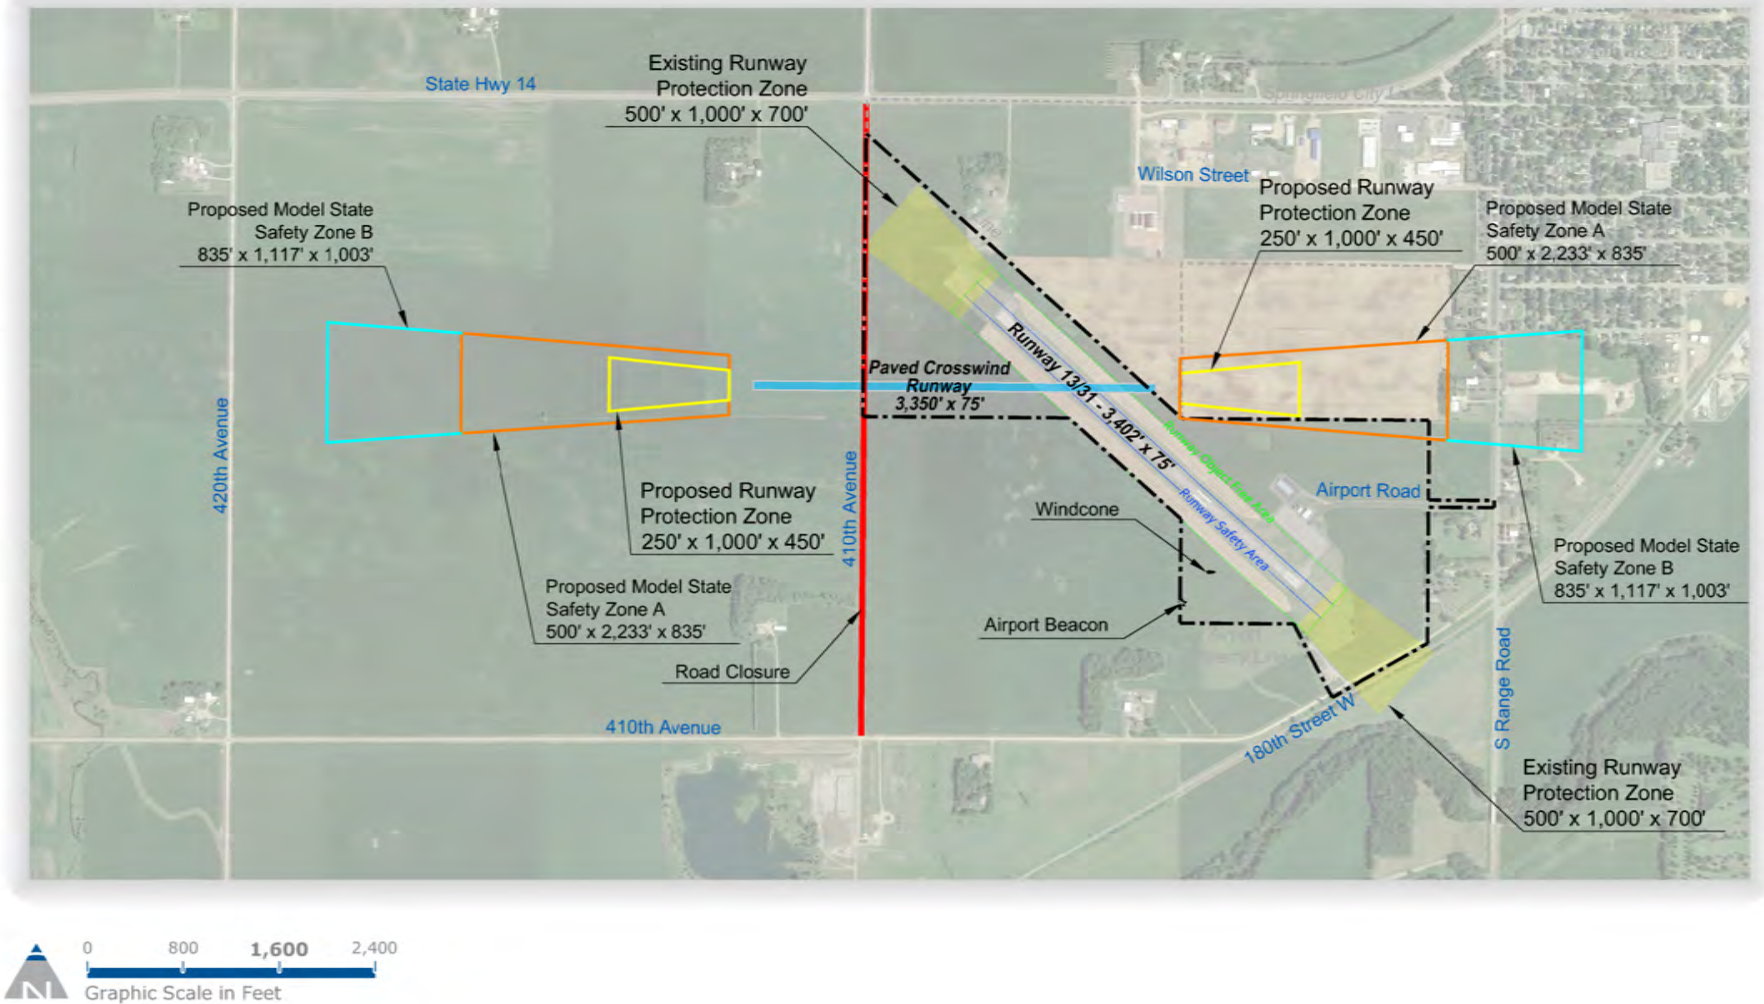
Crosswind Runway Alternative 2: Paved 3,350' Runway
